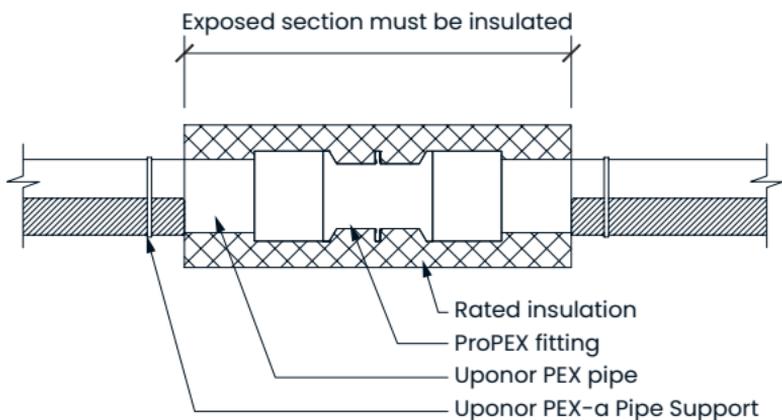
PEX-a Pipe Support installations in ASTM E84 applications
